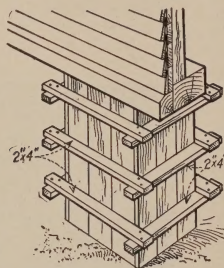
Upper left: Method of building form for casting pier of concrete to replace old foundation or wooden supports. Of course, it is necessary to jack up superstructures while concrete is being poured and is hardening. Jacks and temporary supports are not shown in the illustration. In photograph is shown concrete foundation under barn having a wooden superstructure.
